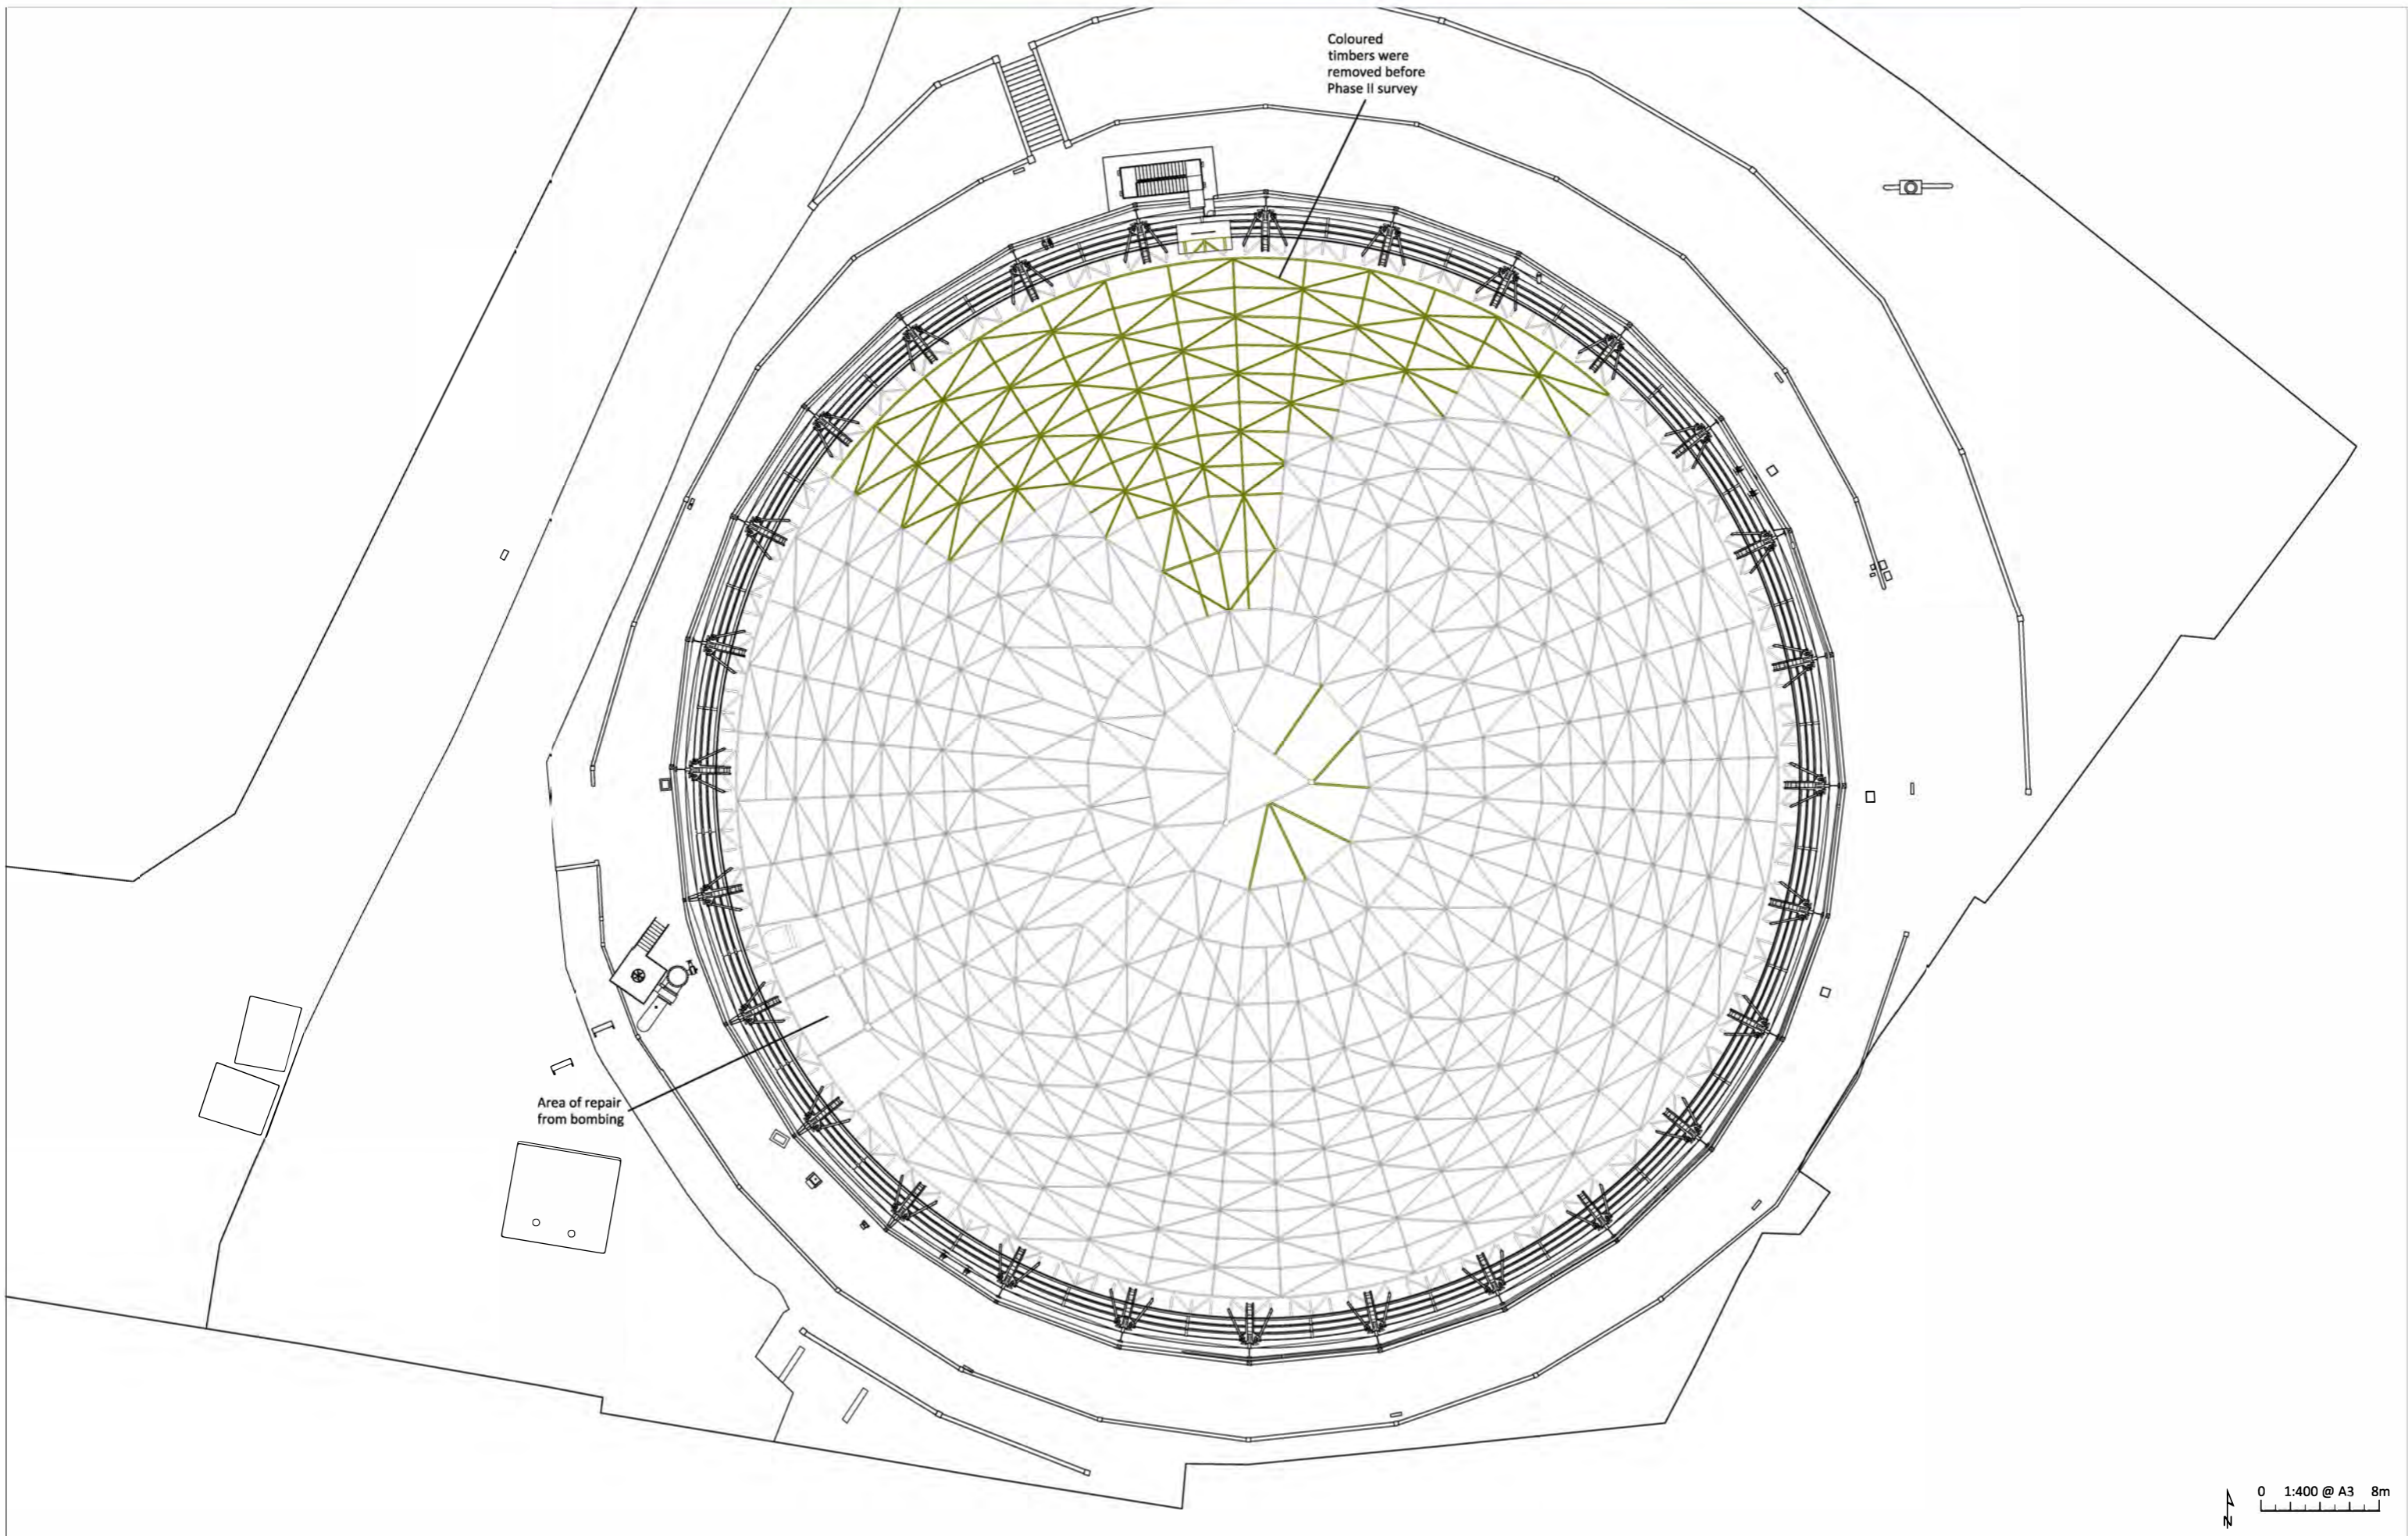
Blackwall Lane, Greenwich, Gasholder No 1, Crown Rest Frame Plan
